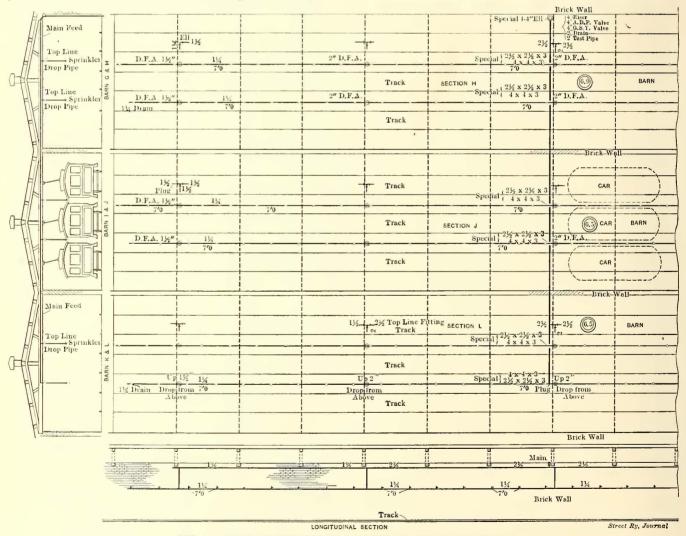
PART OF SPRINKLER LAYOUT IN THE CAR HOUSE
